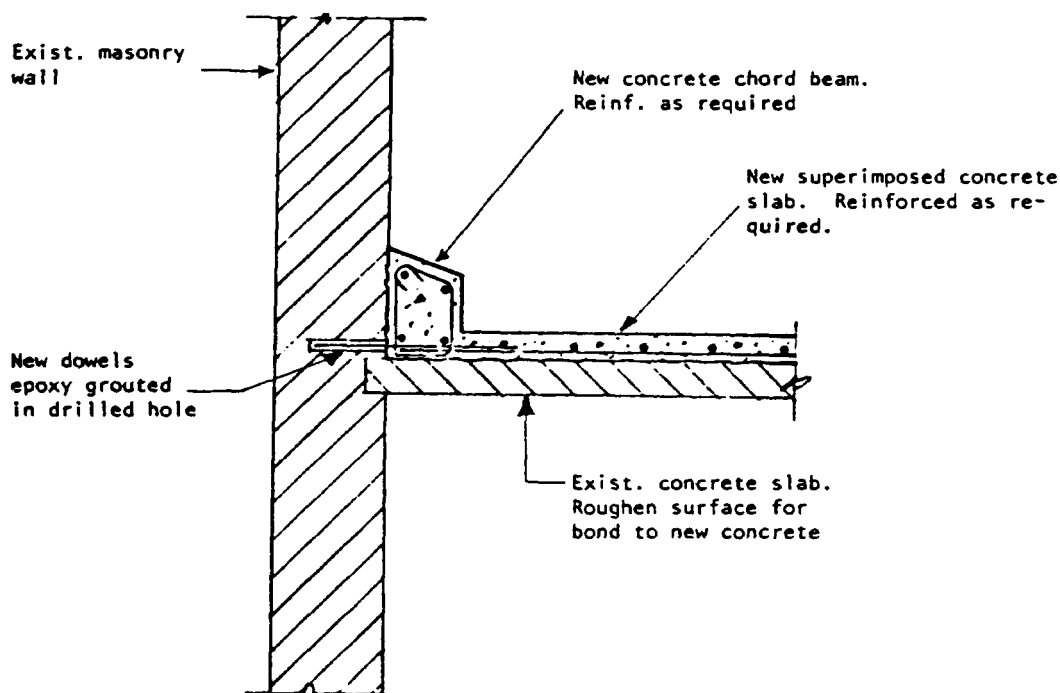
Superimposed diaphragm slab at an existing masonry wall
